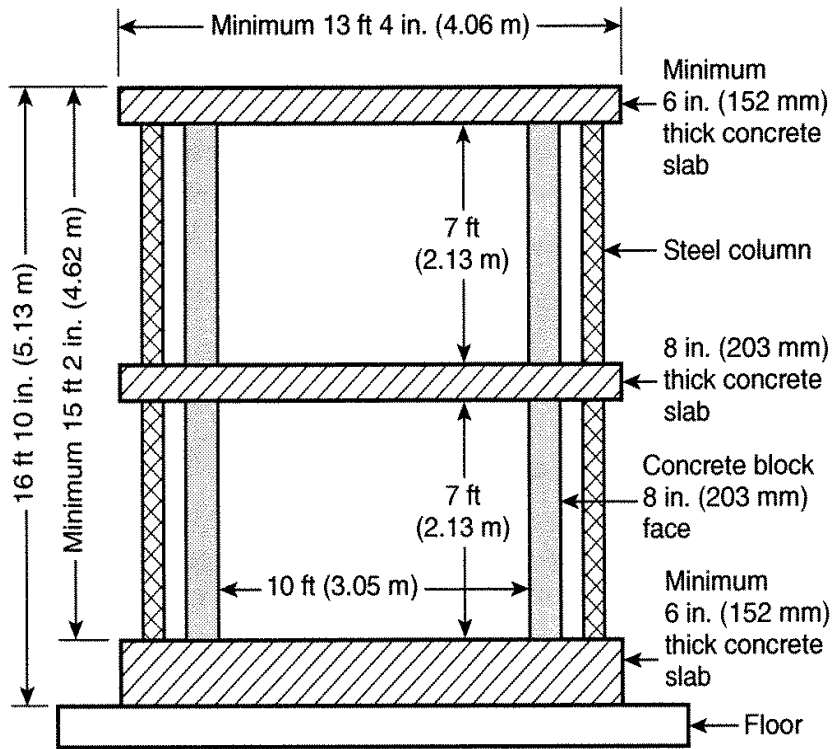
Front View of Test Apparatus Structure (not to scale).
